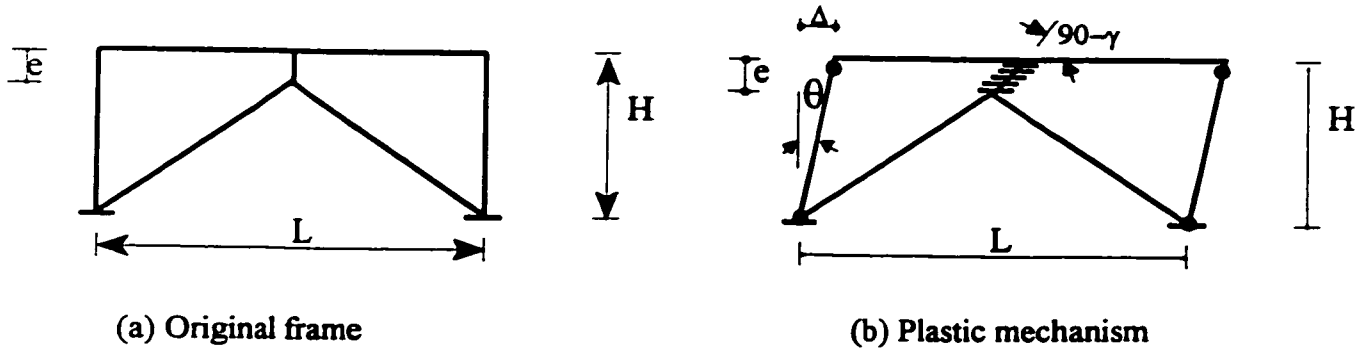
An assumed plastic mechanism of a reinforced concrete frame provided with a vertical steel link
